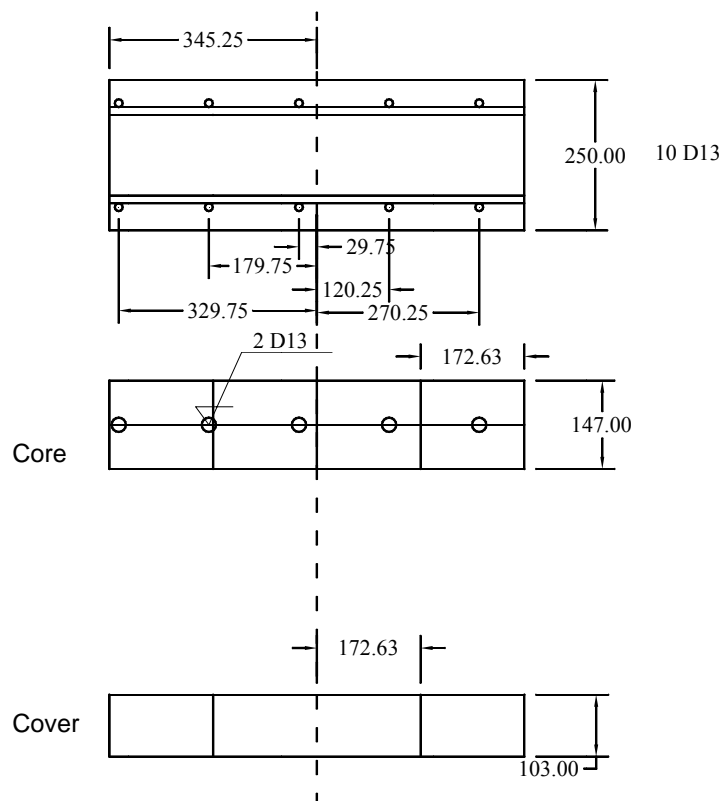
Second-story mid-section element cross section (Units: mm)
